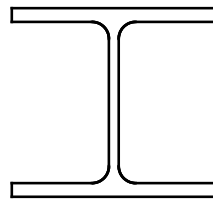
Unloaded columns — Thermal isolation, installation to cover slabs
